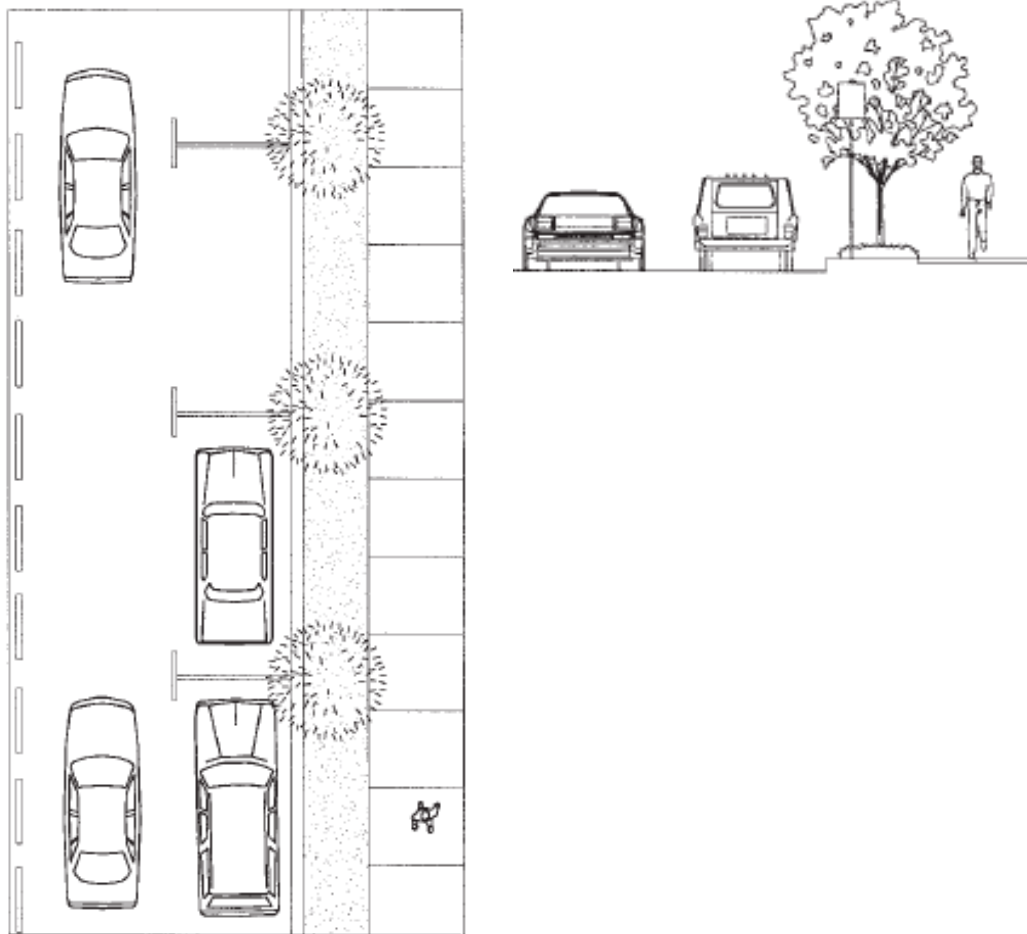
On-street parking as a buffer between street and pedestrian walkway (Pedestrian and Streetscape Guide, 2003: 111)
